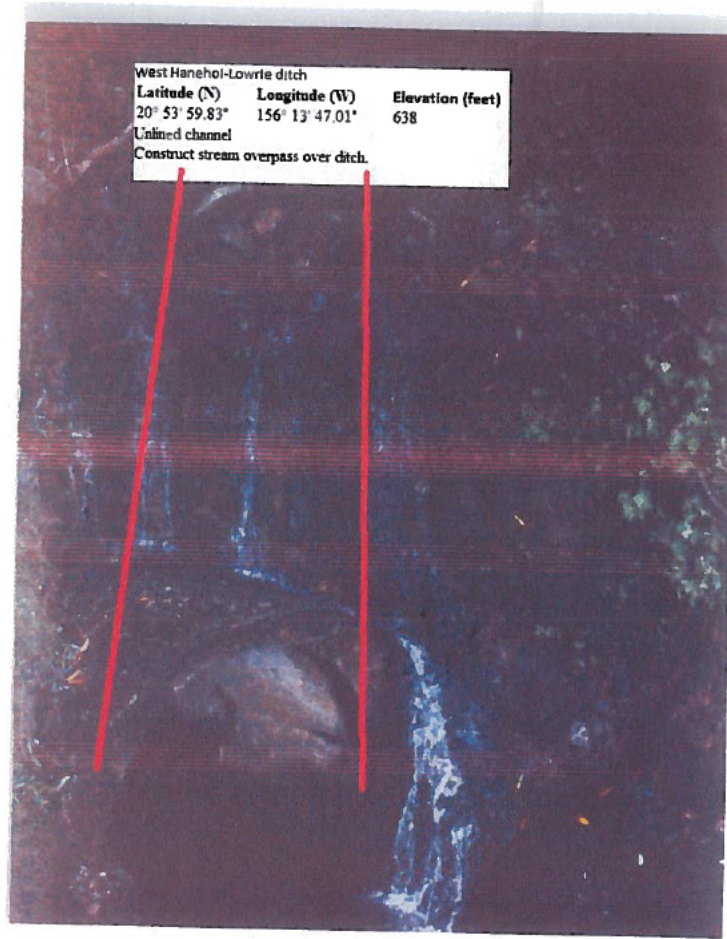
(above): Hanehoi West #2 at Lowrie Ditch (L-7b)
